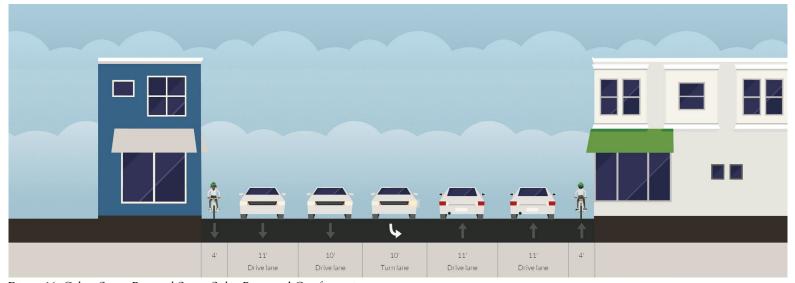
Cabot Street-Rantoul Street Split: Proposed Configuration
